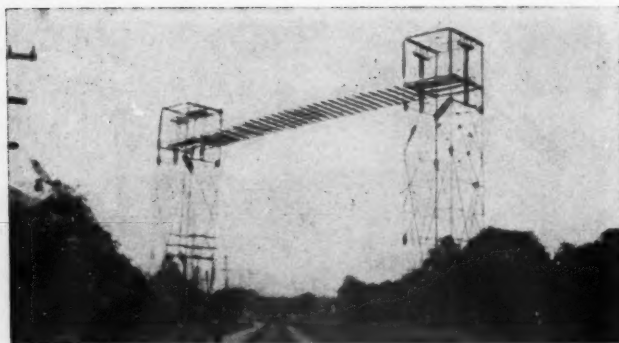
Suspended guard bridge over B. & O. R. R.
